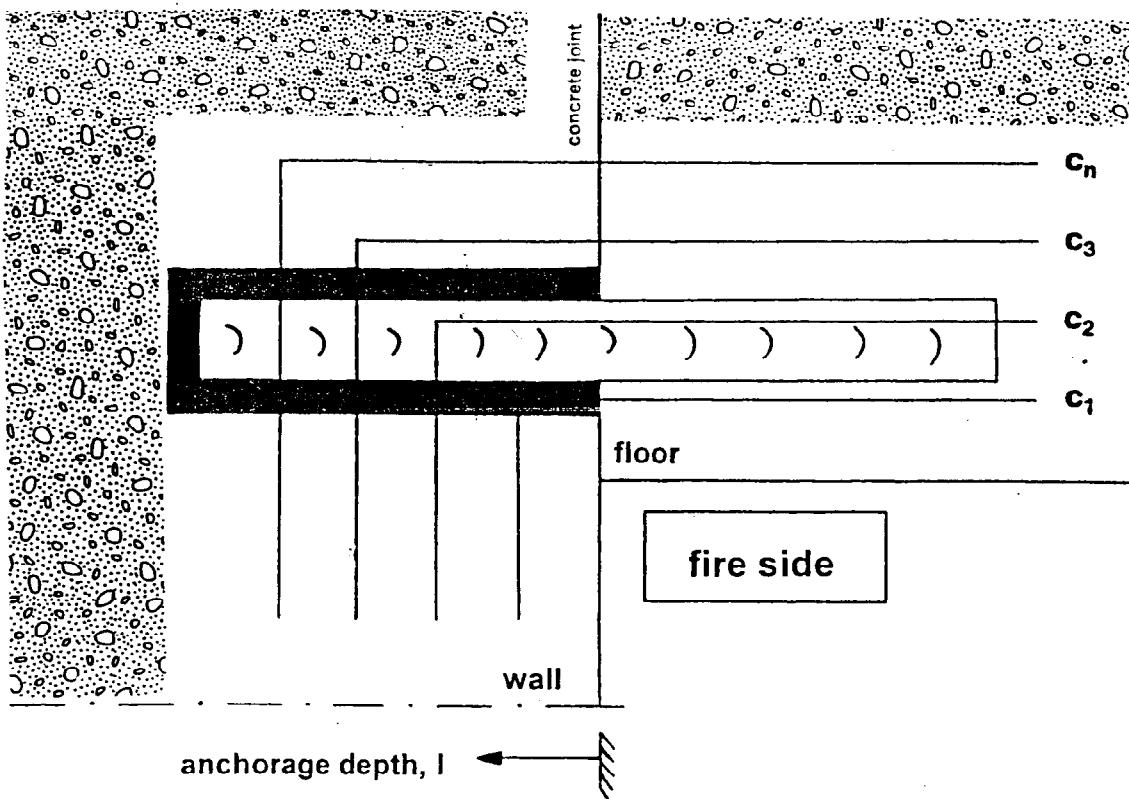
Schematic depiction of rebar connection version ANCHORING
